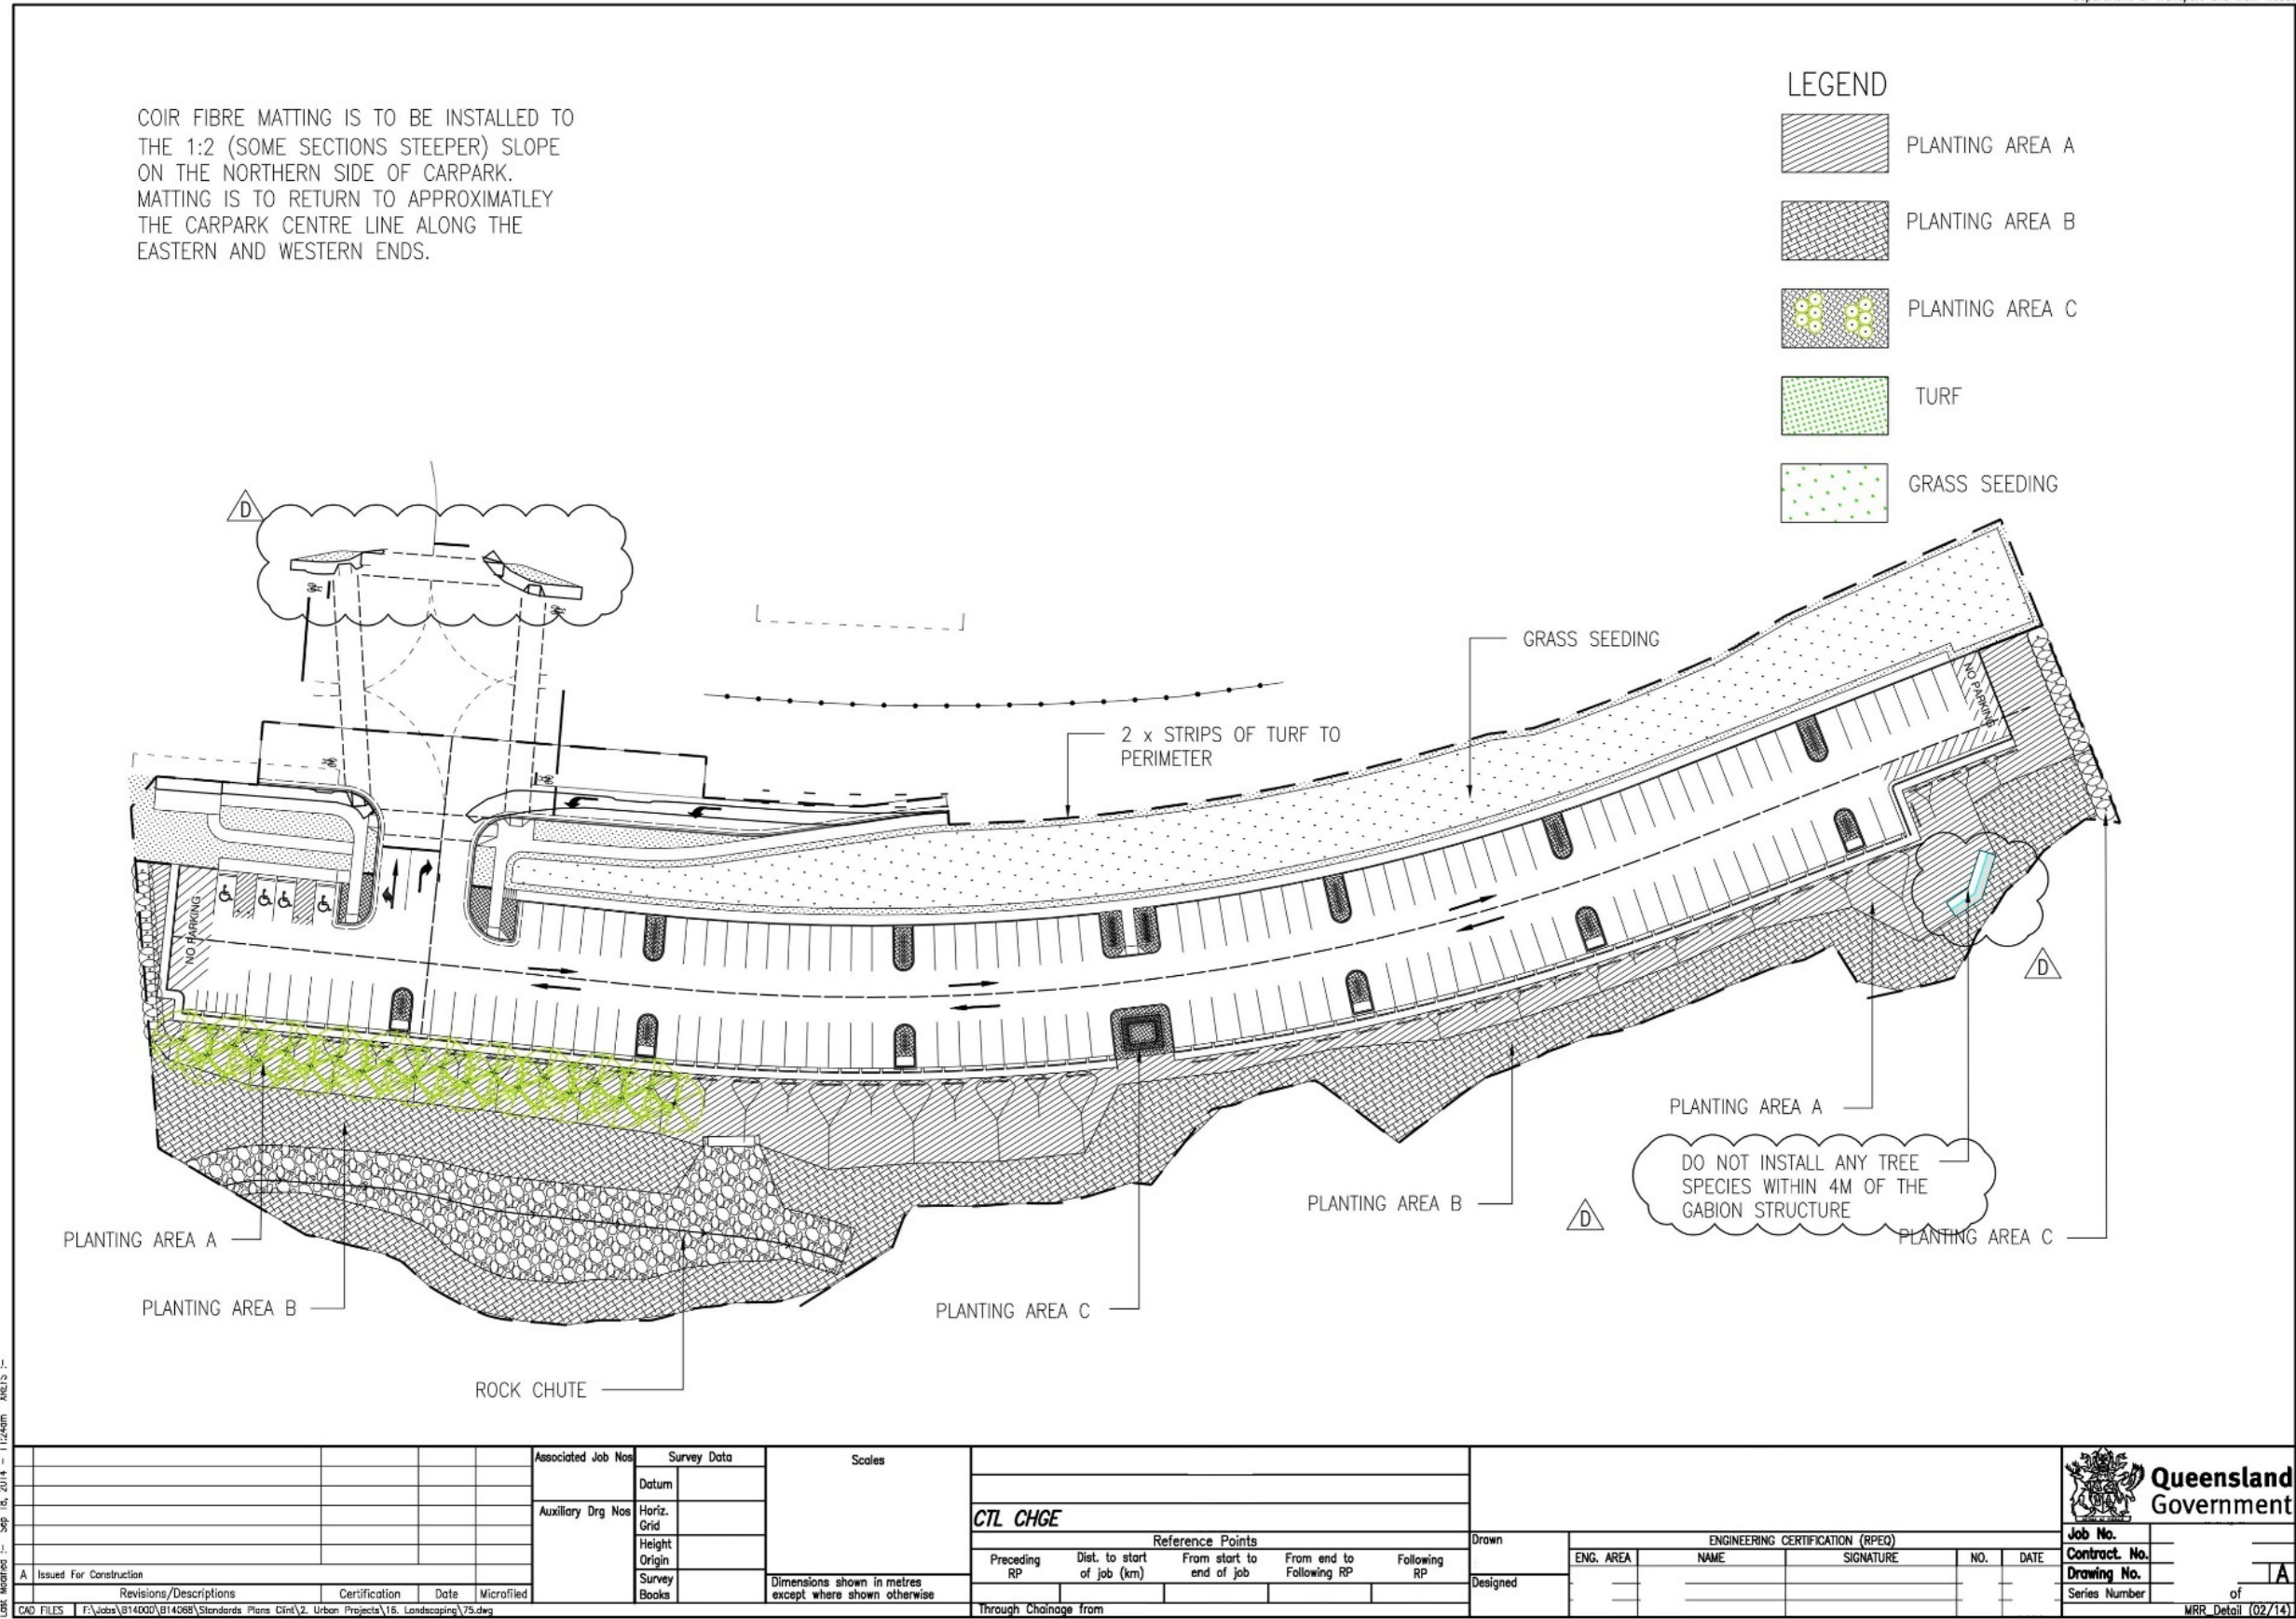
(d) – Landscaping layout and details – generic example 4
